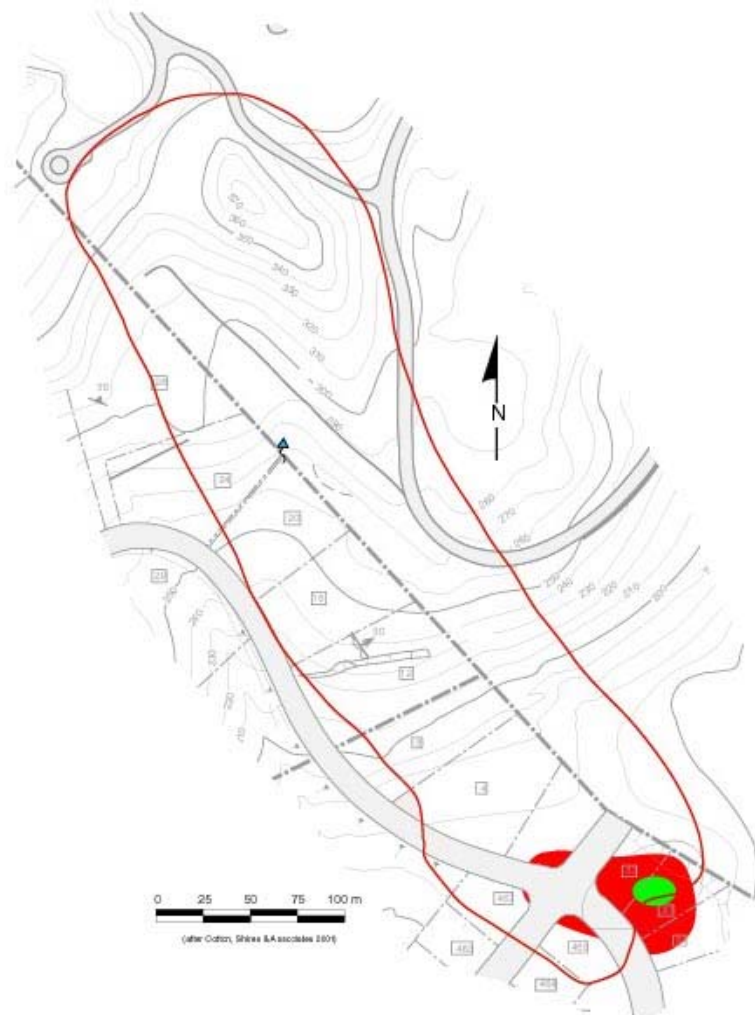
Plan view illustrating the areas of greater than 3.5 m and 6.1 m (ellipsoidal area) of surface grading
